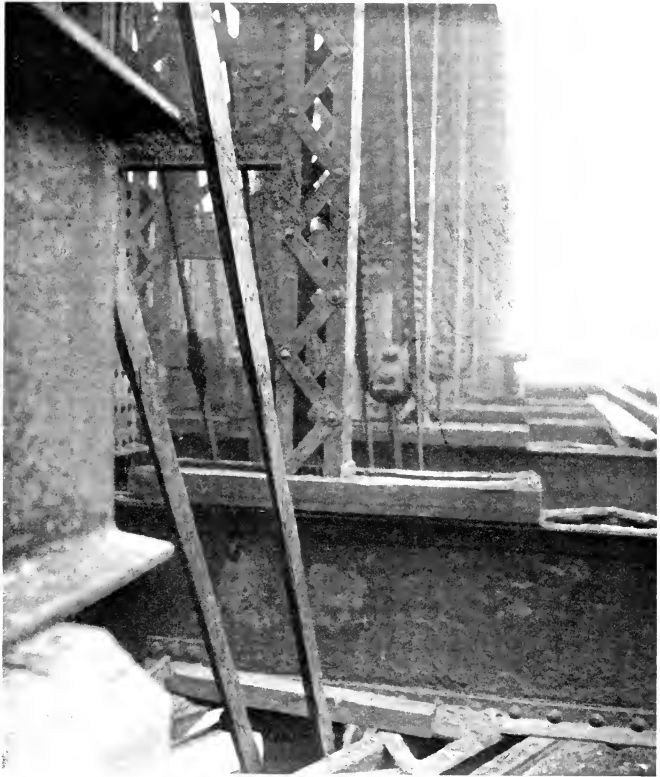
BOYLSTON STREET BRIDGE. TYPICAL CORRODED DIAGONAL OF ORIGINAL TRUSSES.
